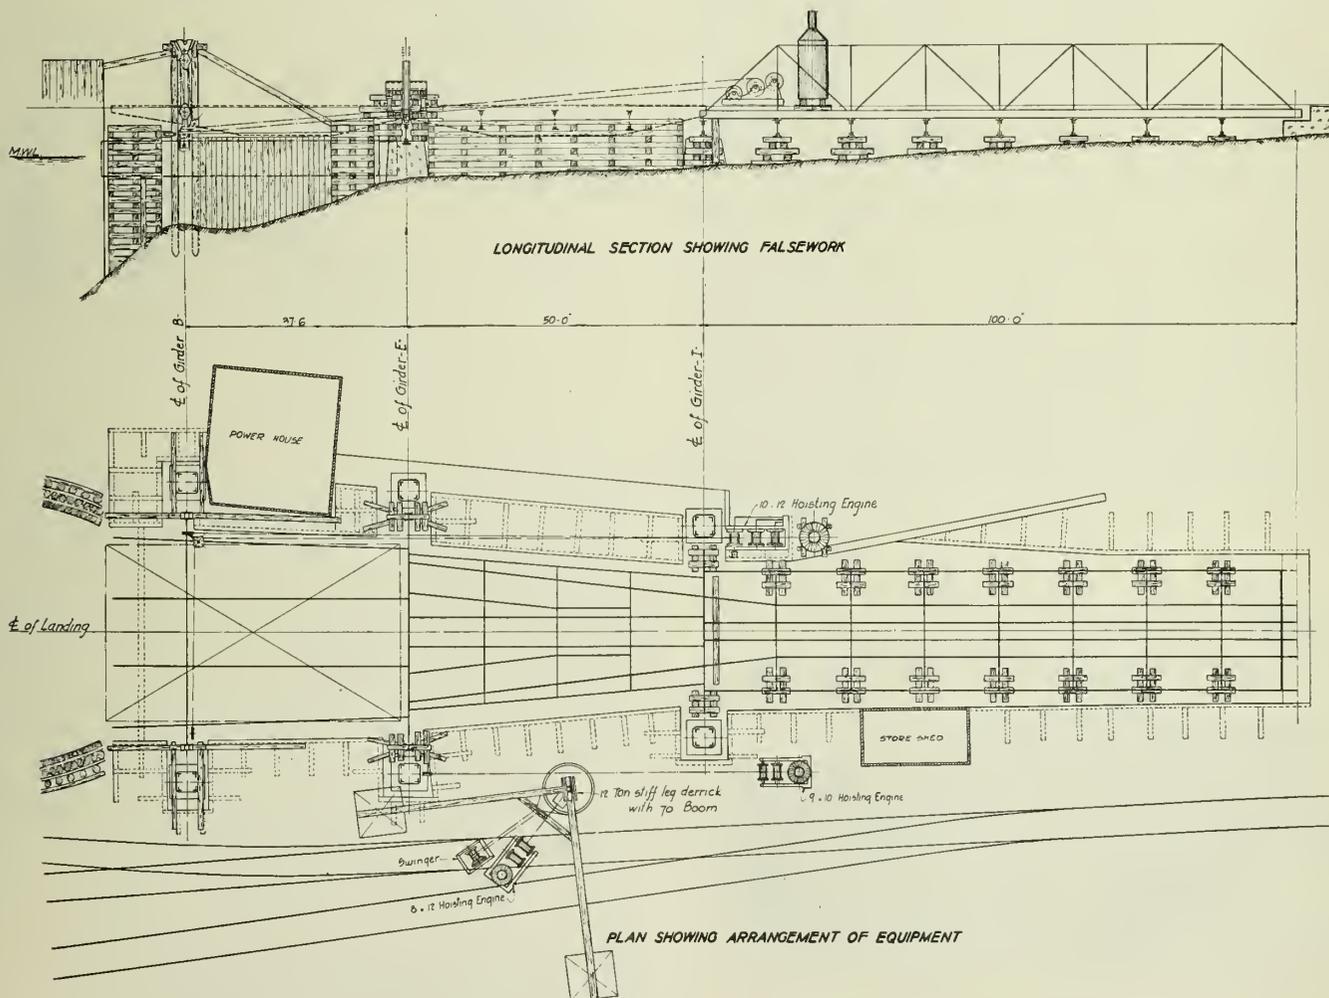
Plan showing Arrangement of Erection Equipment and Falsework.
